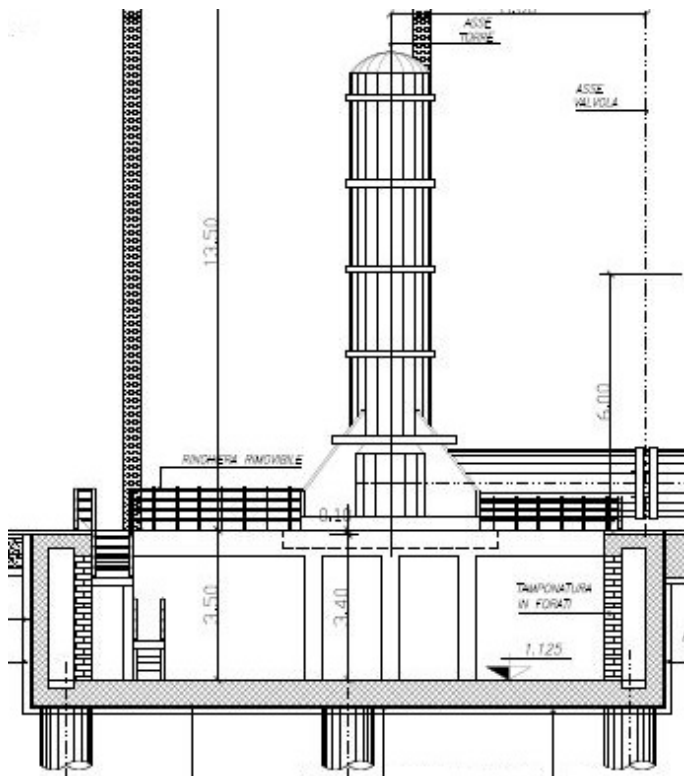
Technical drawing showing Virgo’s West End Building (WEB) tower in profile. Note basement room extending beneath tower and supporting piles.
